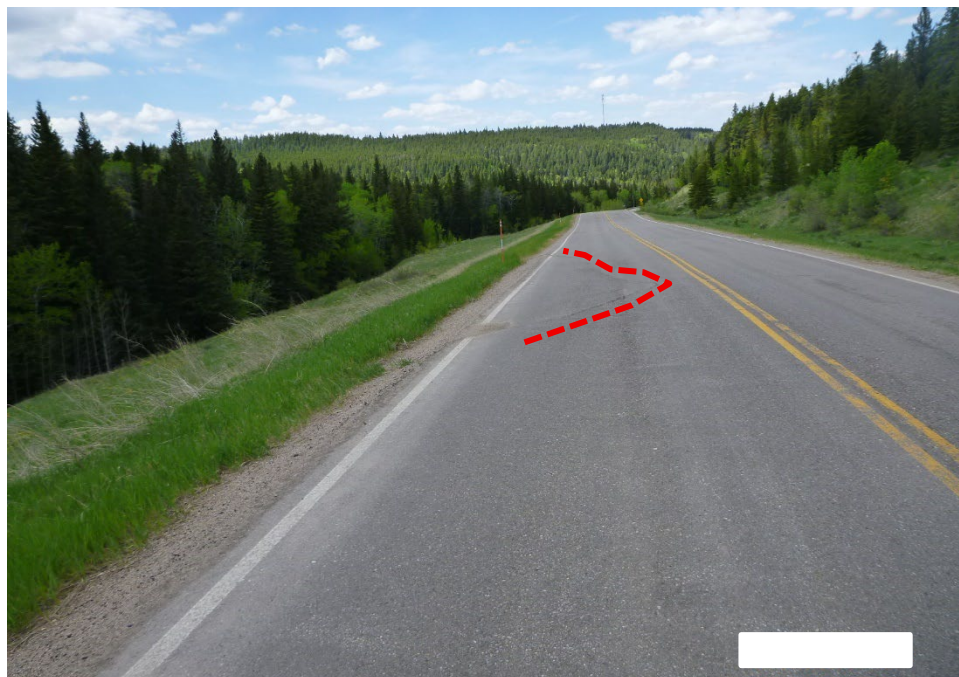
Settlement in the east (northbound, red arrow) highway embankment slope above the culvert underlying the highway. Photo taken May 28, 2025, facing southeast.
